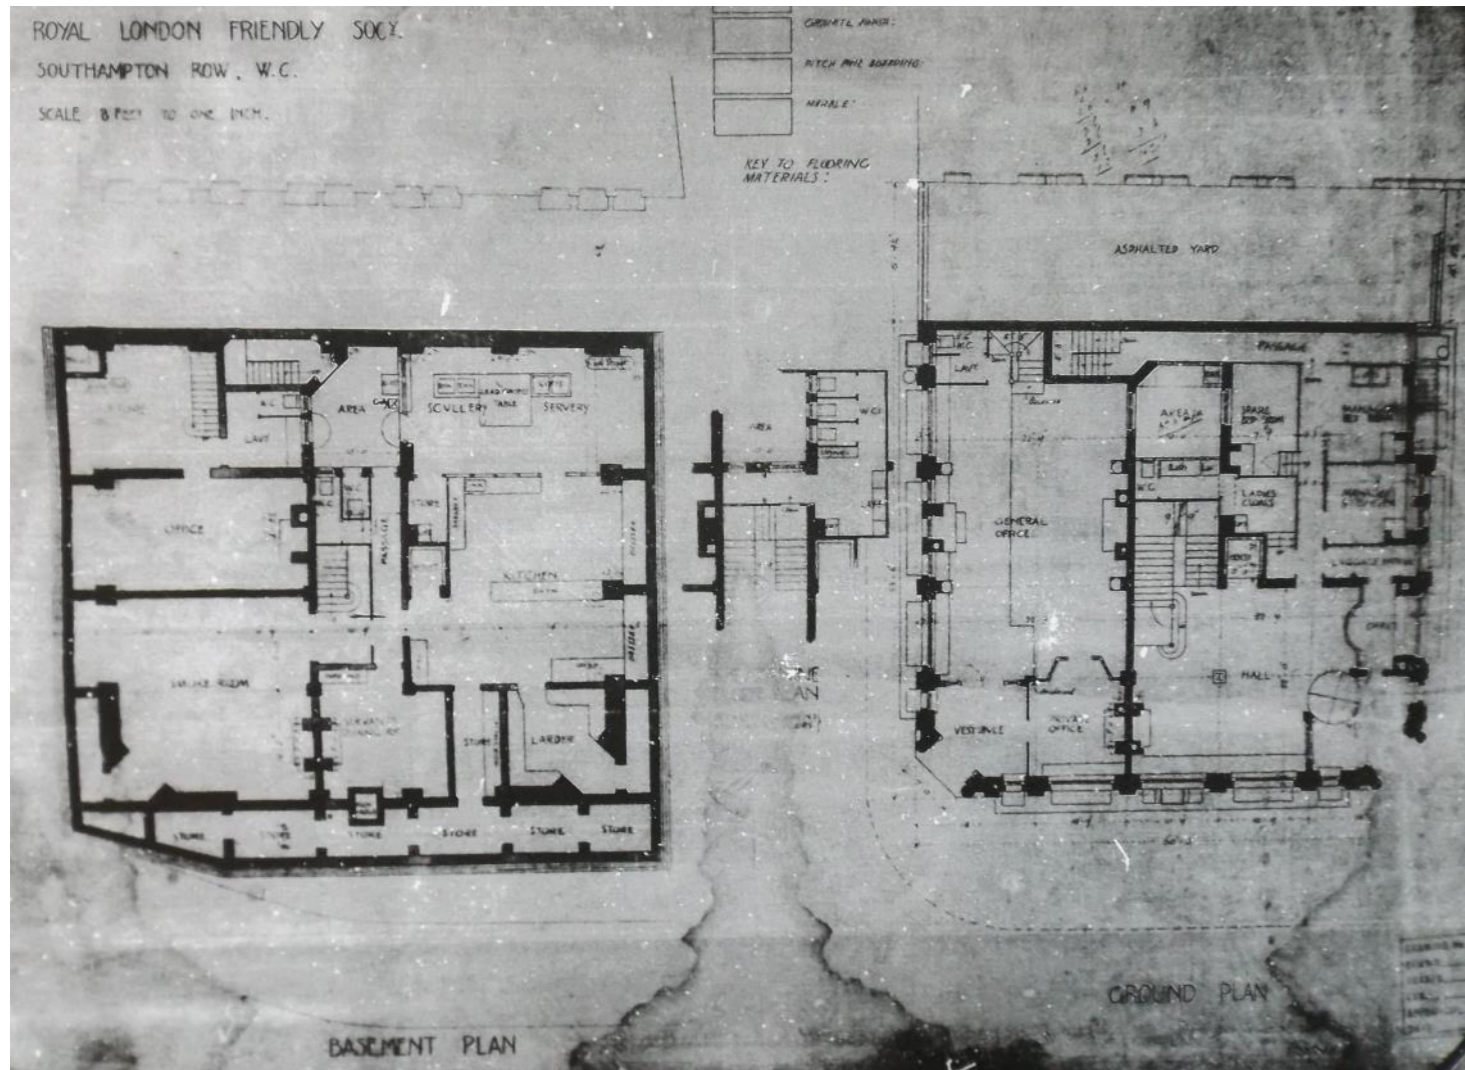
Basement and Ground Floor Drainage plans of the newly constructed building (1905)
